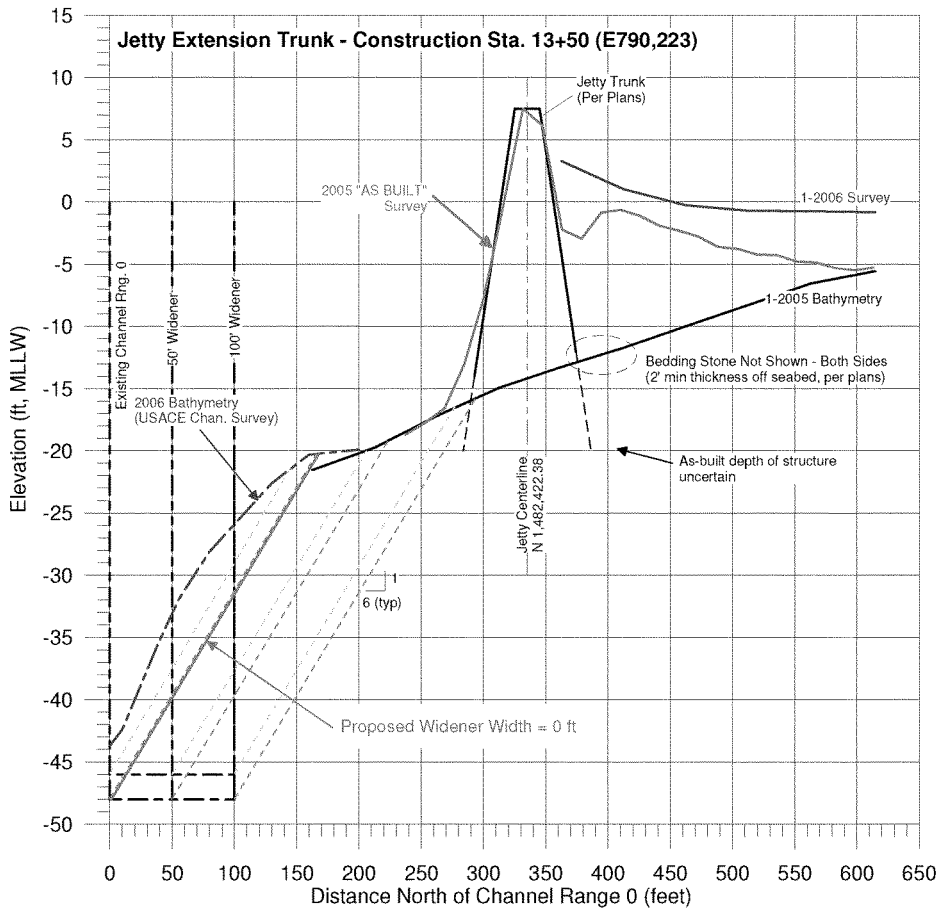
Proposed widener at USACE jetty Station 13+50 relative to the north jetty – jetty position is based upon the 2005 as-built survey and construction drawings.
